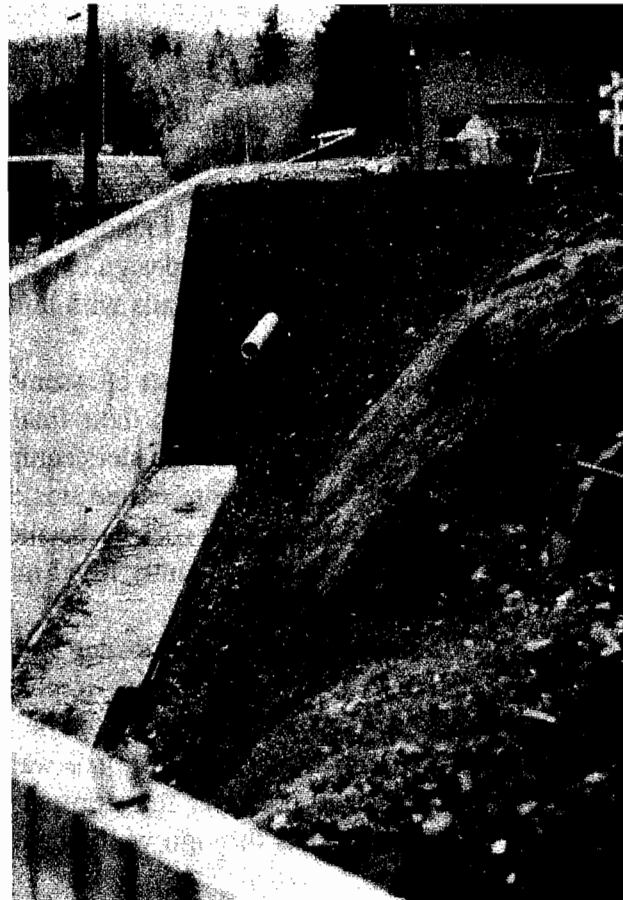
Cross-sectional view of cantilever wall showing drain pipe.
